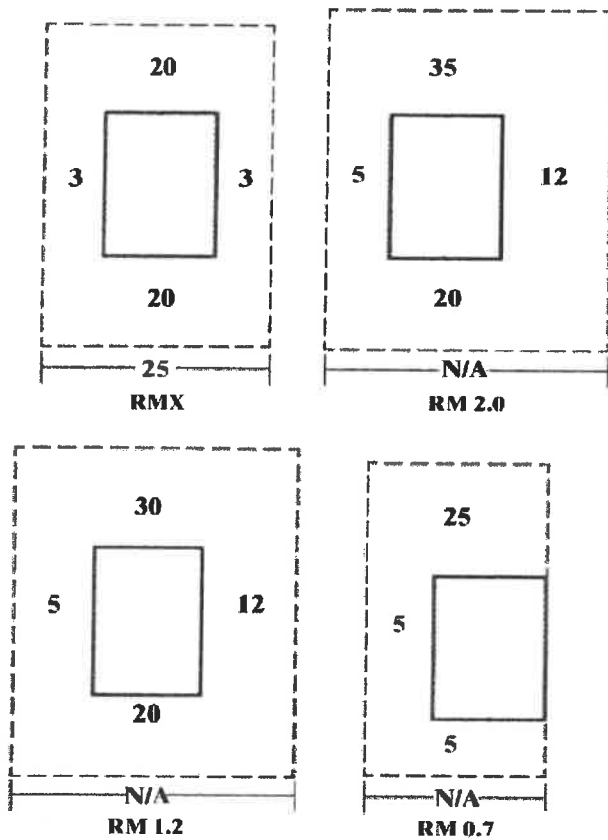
Minimum Setbacks for Multi-Family Buildings 35 ft. in Height
